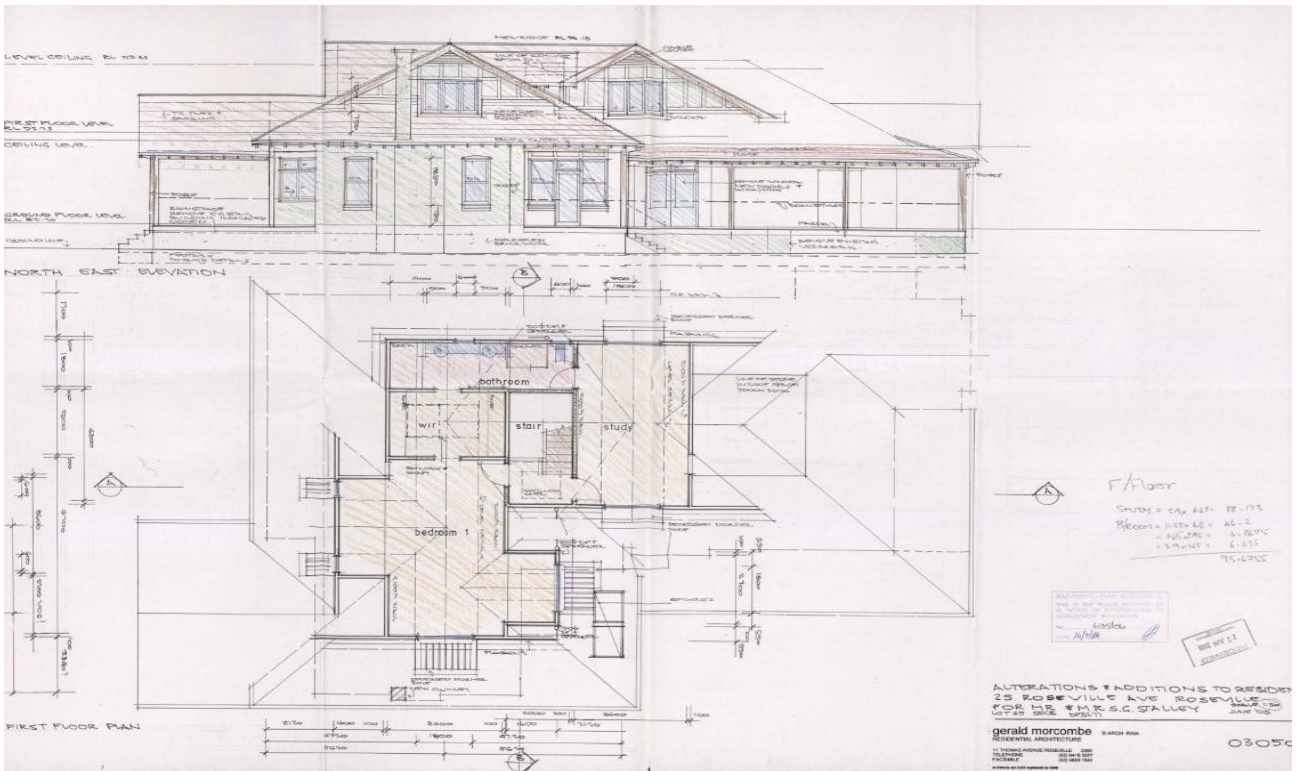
Proposed plans and elevations for unconstructed first storey addition to the dwelling dating from 2009
